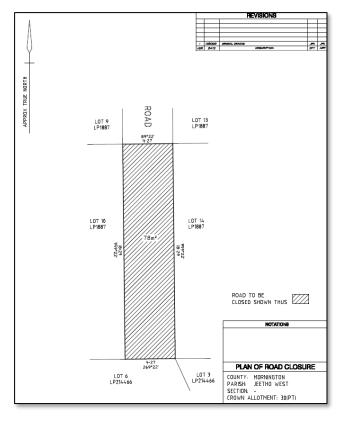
Road Discontinuance Plan - Part Road Reserve - Rear of 10 Clarence Street Loch
